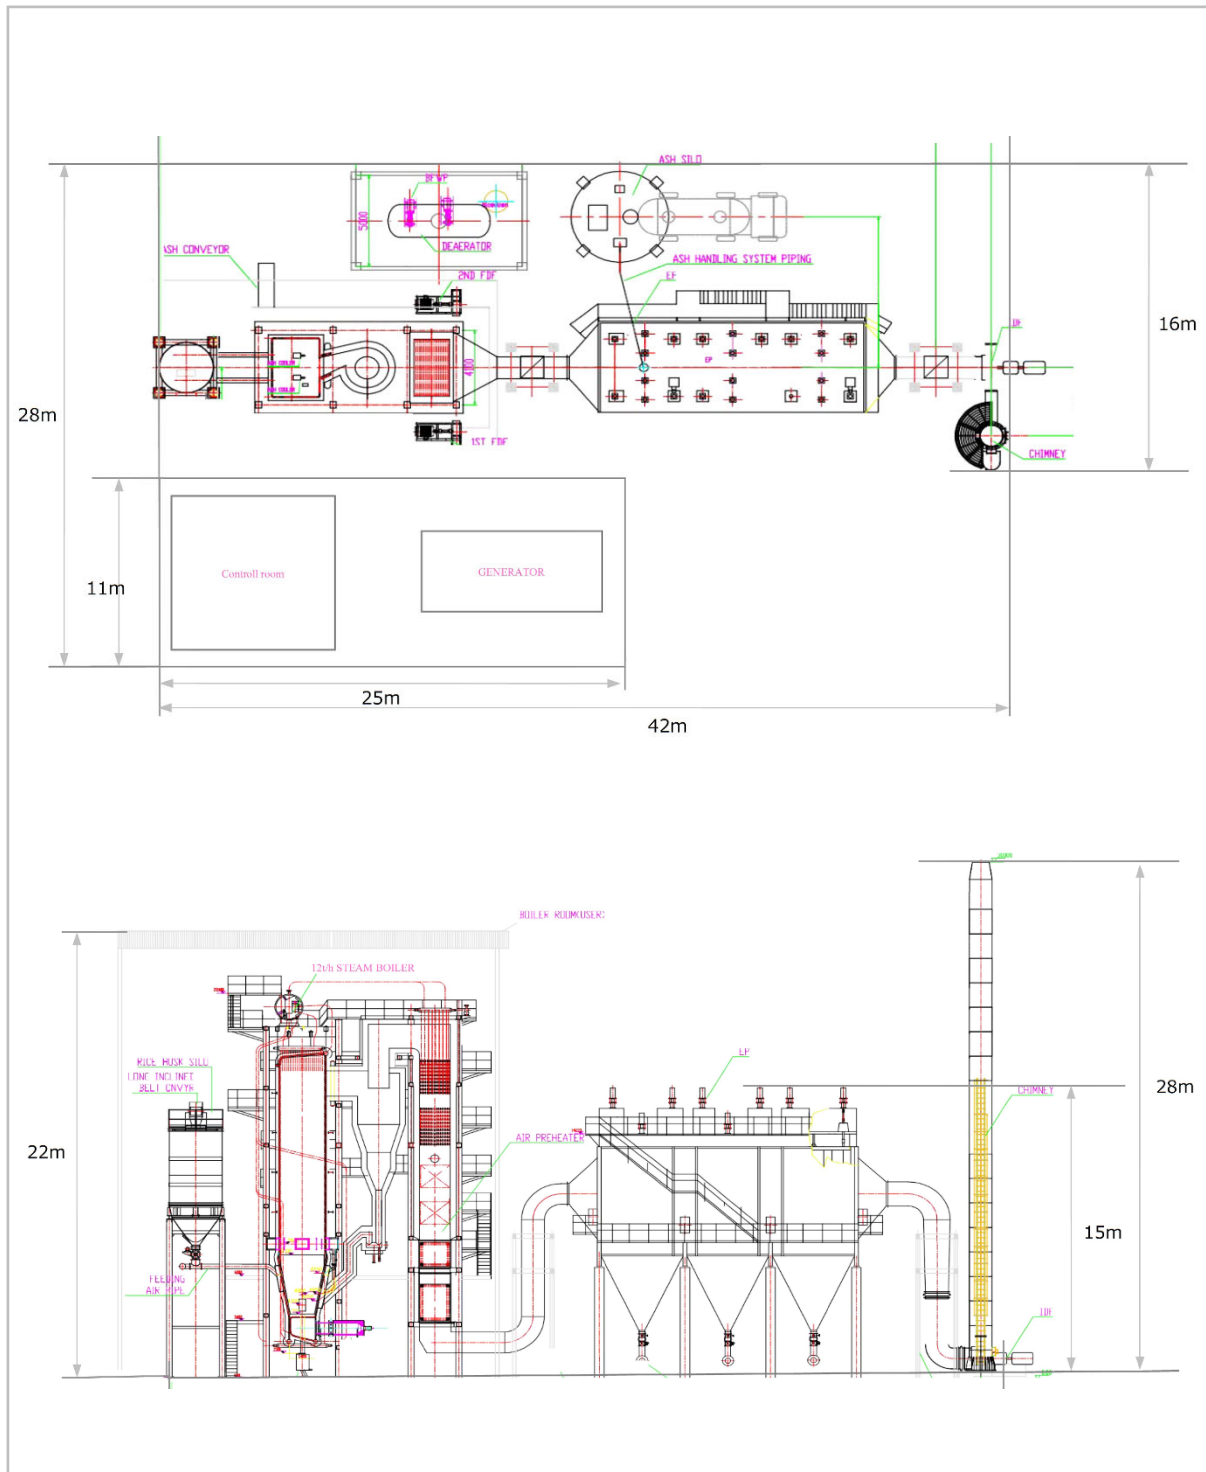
Plan and elevation of the facility (Direct combustion style 1,000kW)
